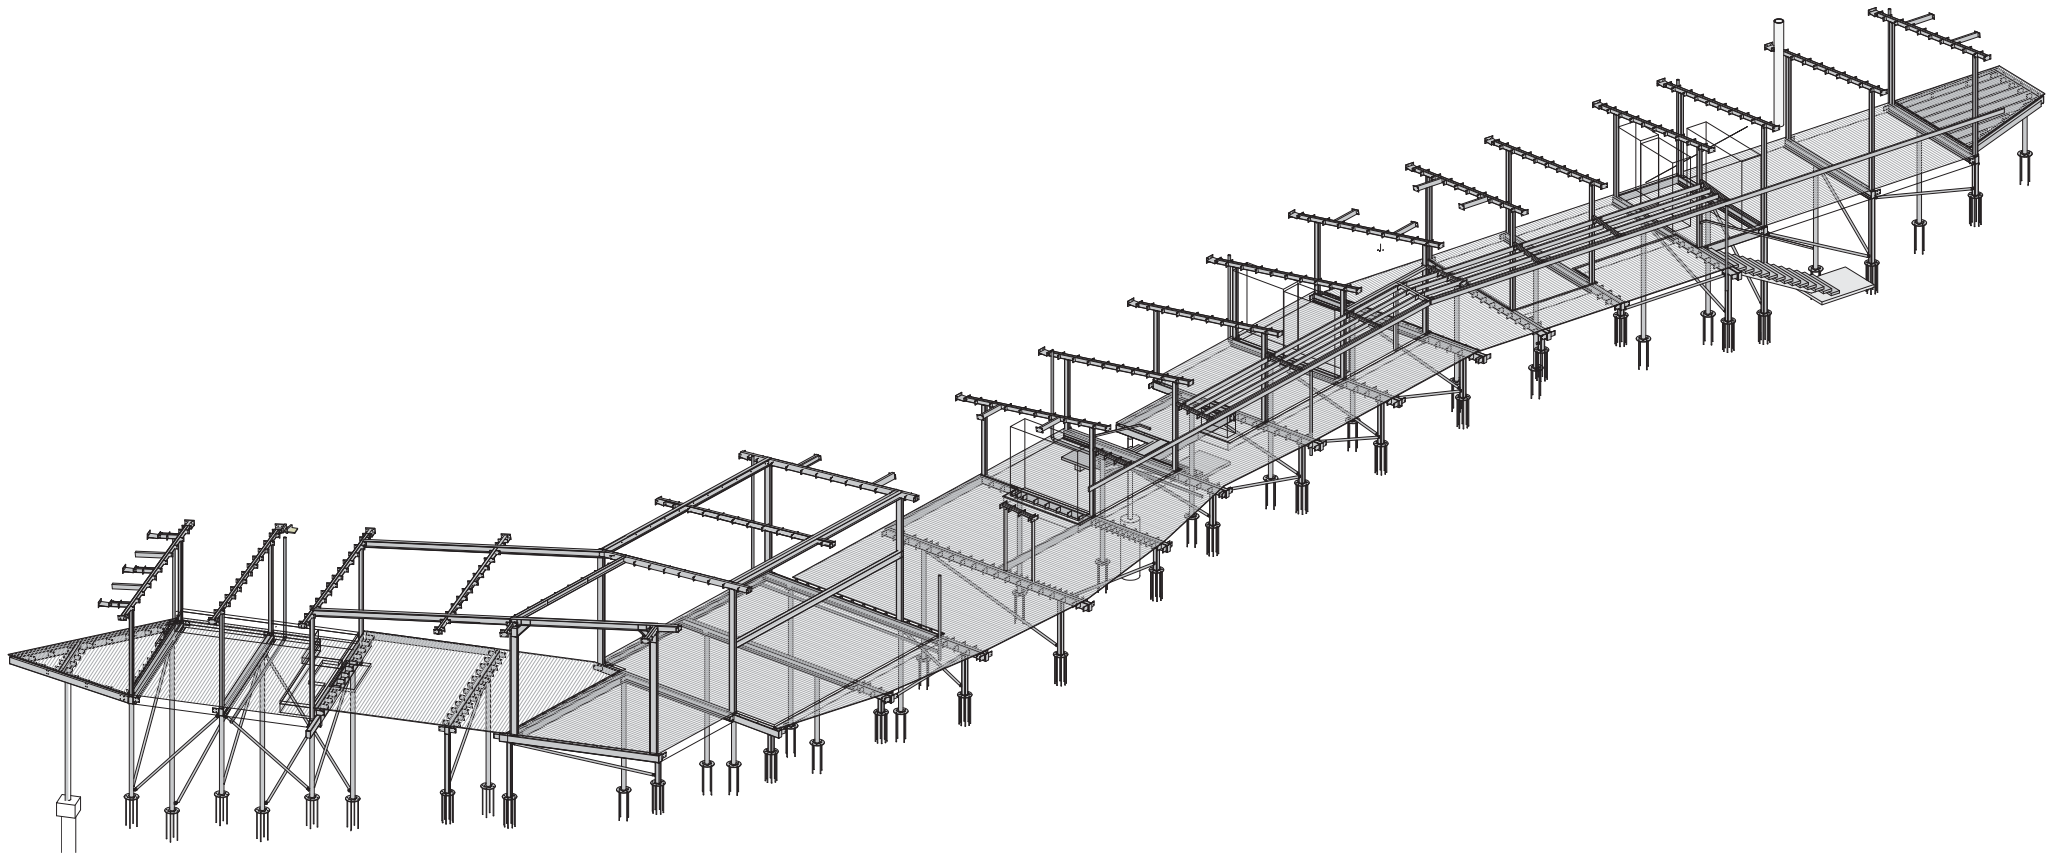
Structural diagram showing sub-floor steel portal frames which are welded to the pile caps below ground. The next stage to be delivered is the main structure of the house above floor level. This is made up of steel portal frames with cantilevered beams and outriggers which creates a large roof overhang.
